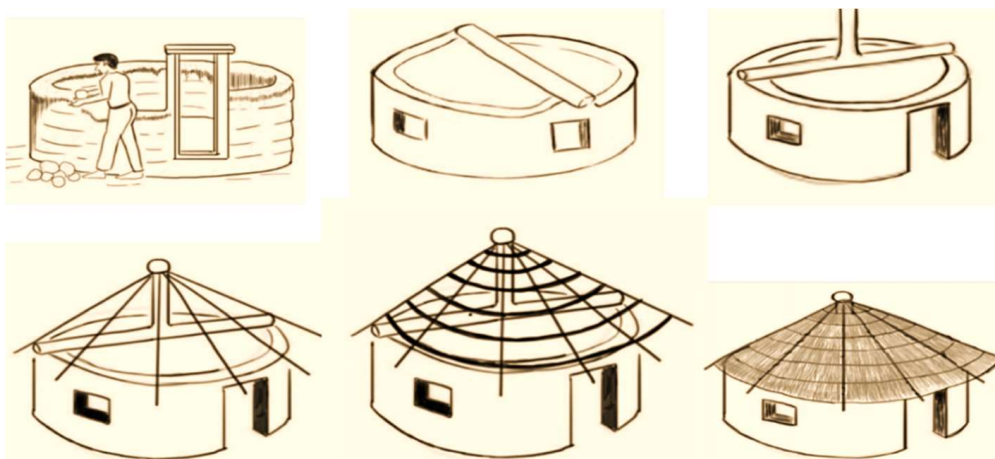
Stages of construction of Bhunga House (Source: Inside and out, NID, 2019)
